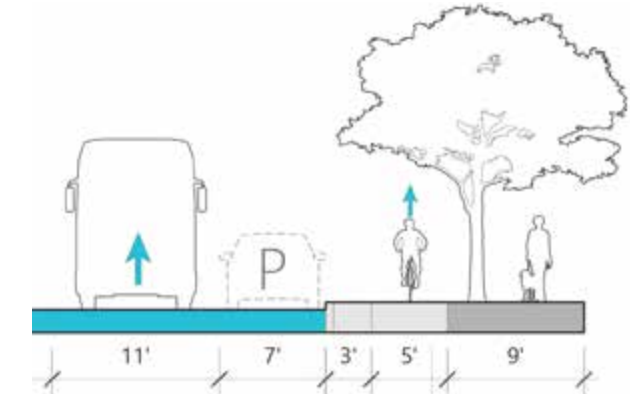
Bus on a Typical Downtown Collector Street with On-Street Parking and a One-Way, Sidewalk-Level Class IV Bikeway.
